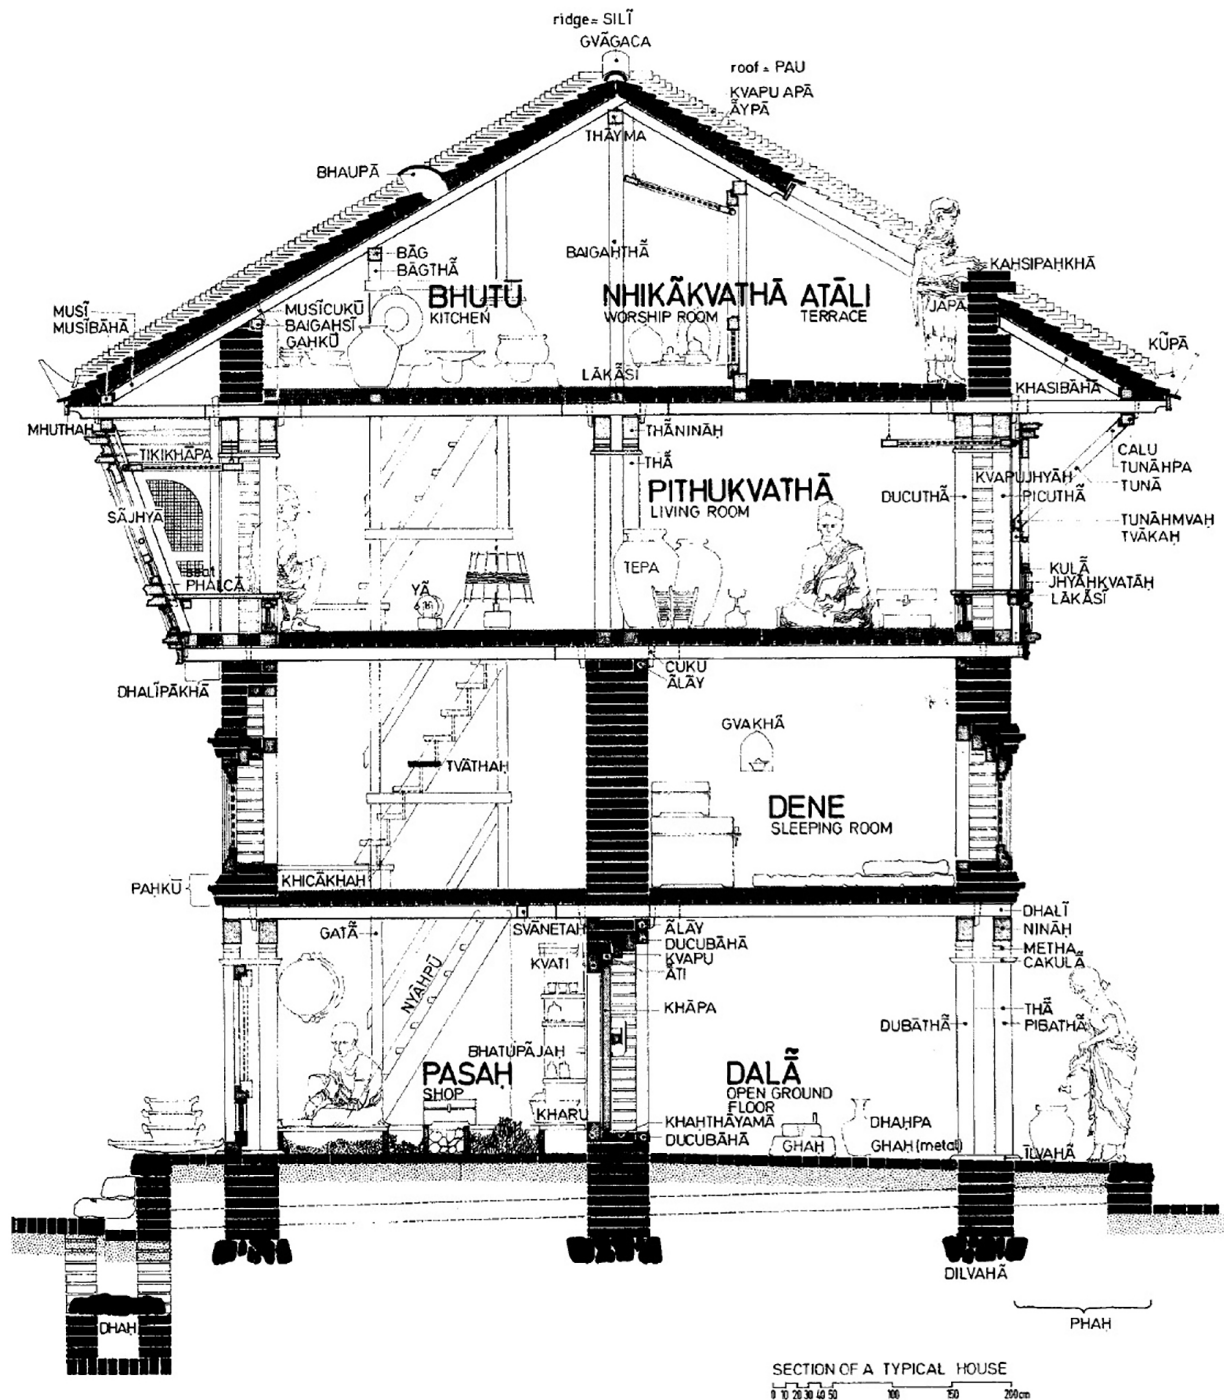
Section of typical Newari house with their local names. Drawing: Niels Gutschow. *Newari towns and buildings
